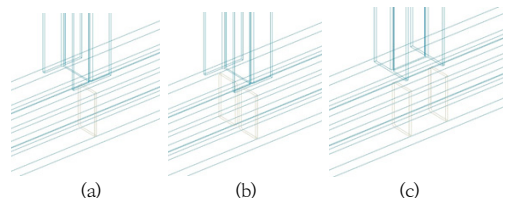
Examples of stiffener installed under rack structure (a) one single face stiffener (b) one both face stiffener (c) two single face stiffeners
